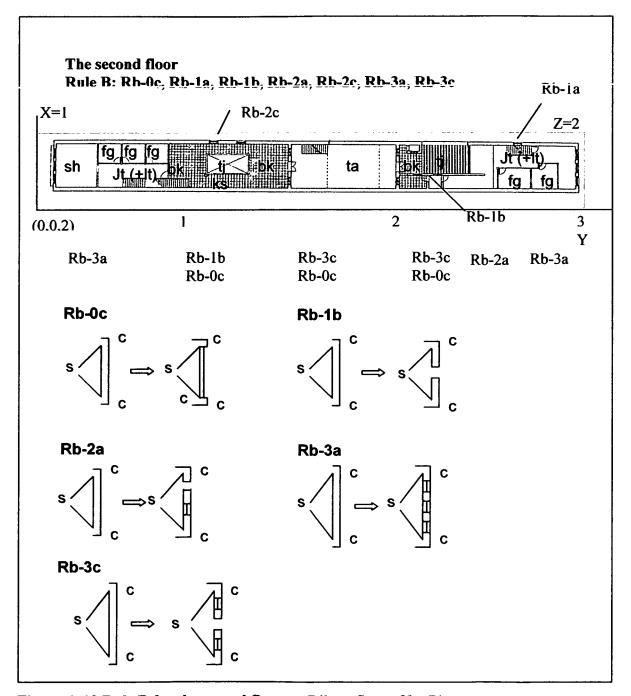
13 Rule B for the second floor at Dihwa Street No. 71
